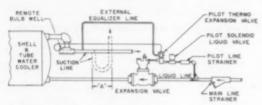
Thermo expansion valve with mechanical type of pressure limiting.
